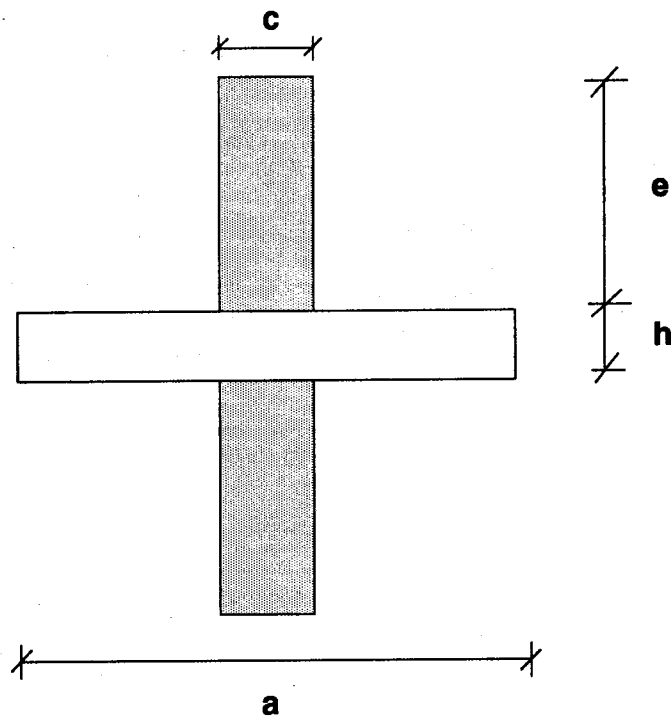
Geometry of Interior Sandwich Plate Specimens
